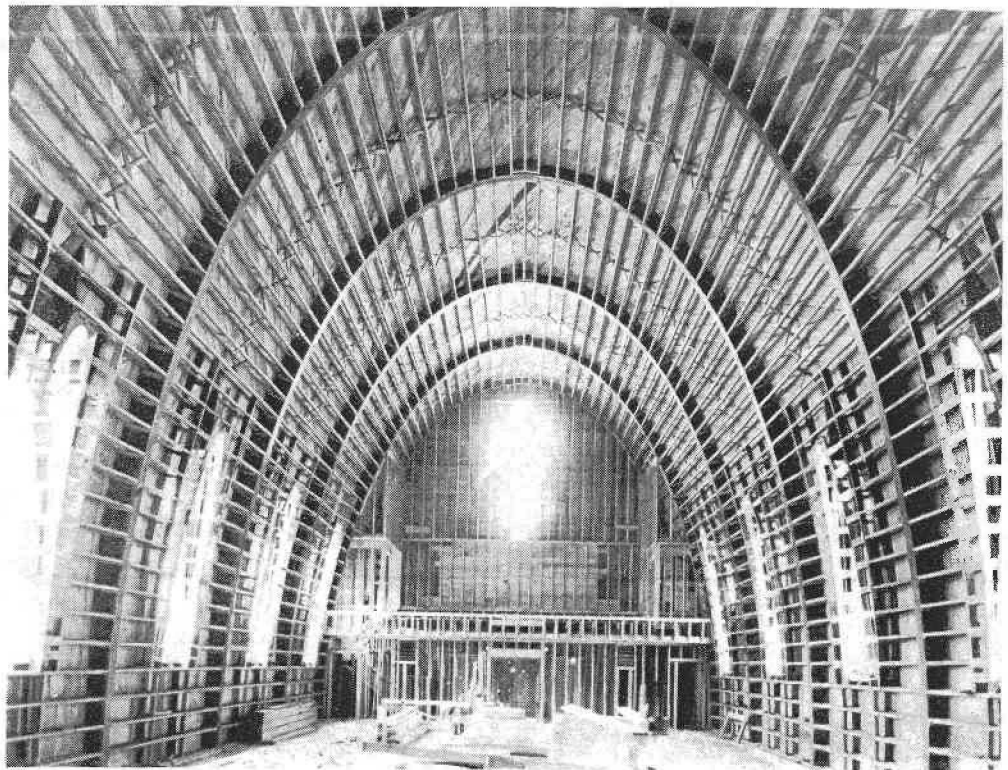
Gymnasium, at Goodman, Wis. Span, 58 feet; rise, 25 feet; spacing of glued laminated arches, 16 feet.
